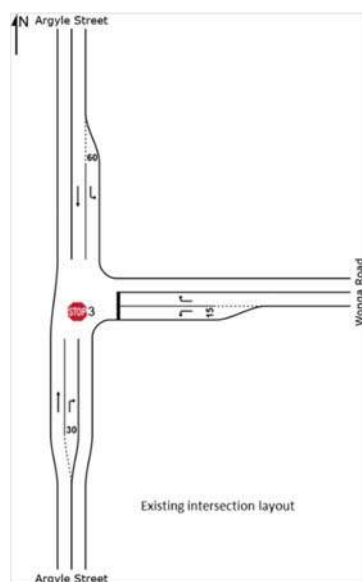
Wonga Road and Argyle Street Intersection – Existing Layout
